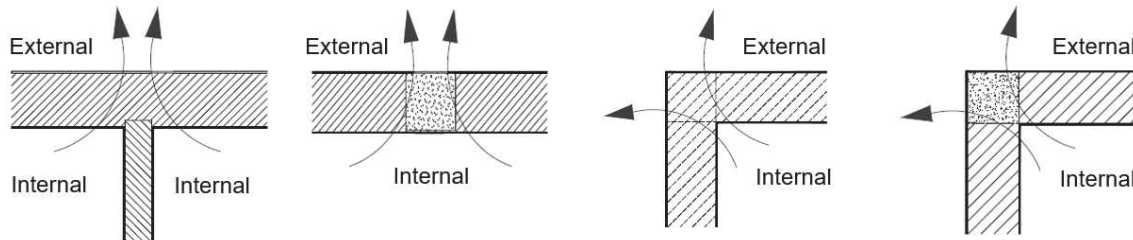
Examples of thermal bridging referring to horizontal disposition of walls/columns UNI EN ISO 14683 2008).
